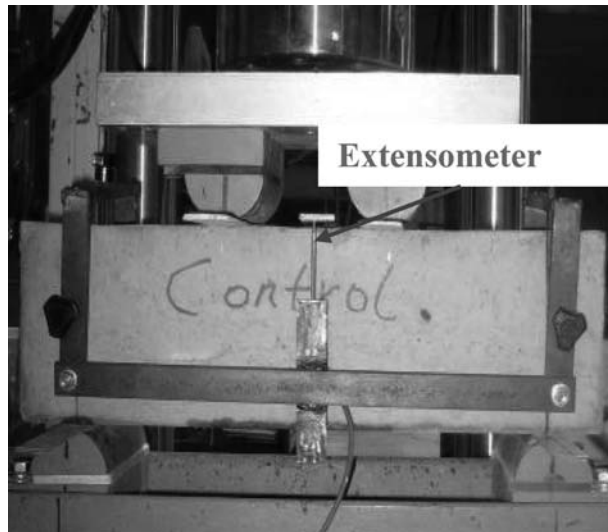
Concrete beam under loading and instrumented with an extensometer.
